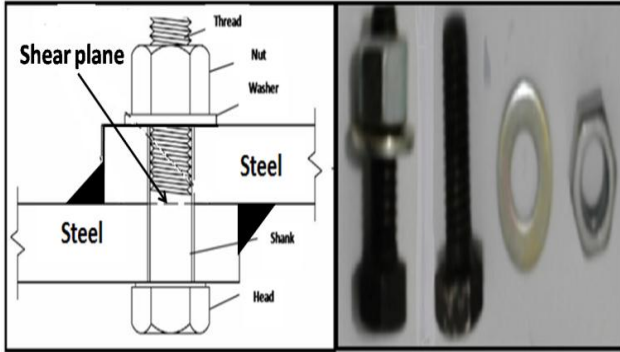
Bolt/double fillet welds mixed joint
